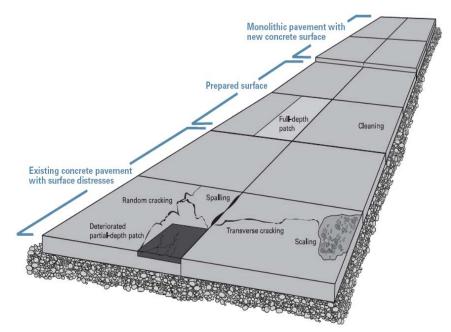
Notable distress on existing pavement and possible repairs for BCOs [4]
